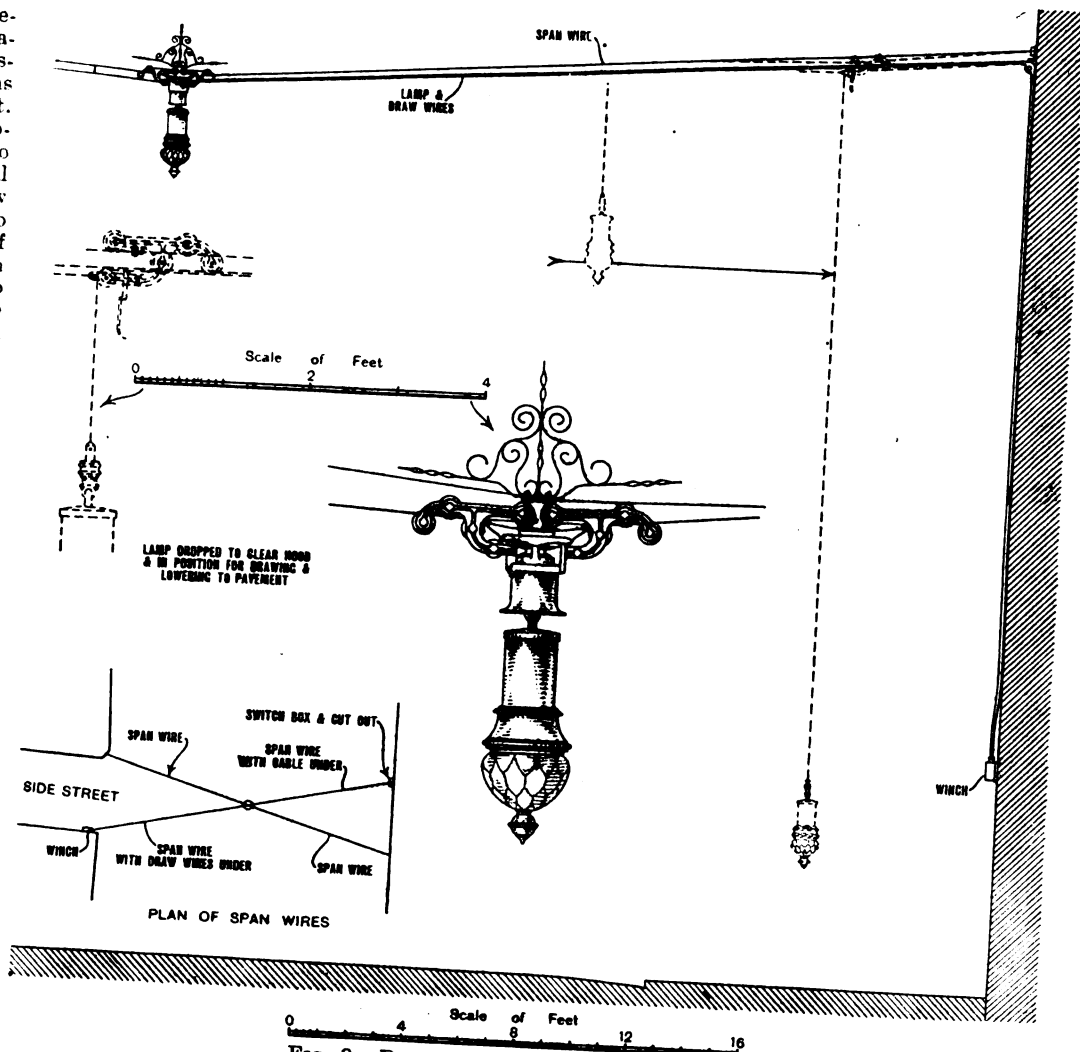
DETAILS OF SPAN WIRE CONSTRUCTION.
